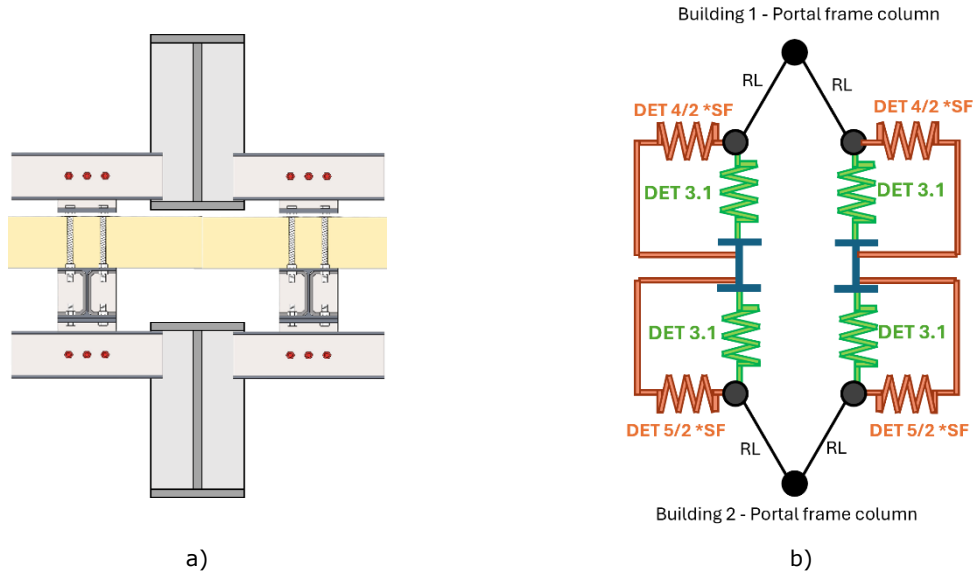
a) geometrical and b) numerical model of Detail 3145.
